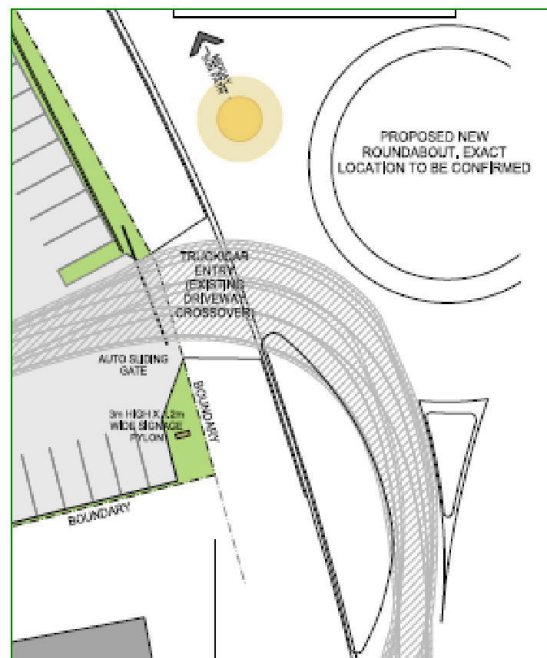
Proposed Roundabout at the intersection of Links Road with Wianamatta Parkway
